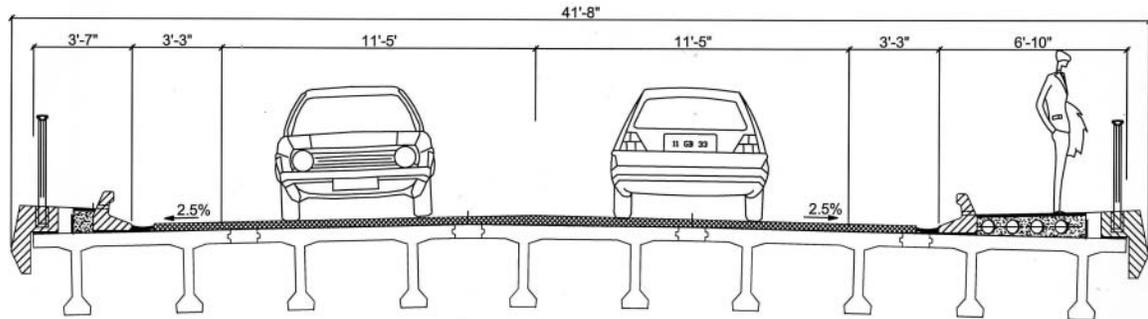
Bourg-lès-Valence bridges - Typical cross-section
